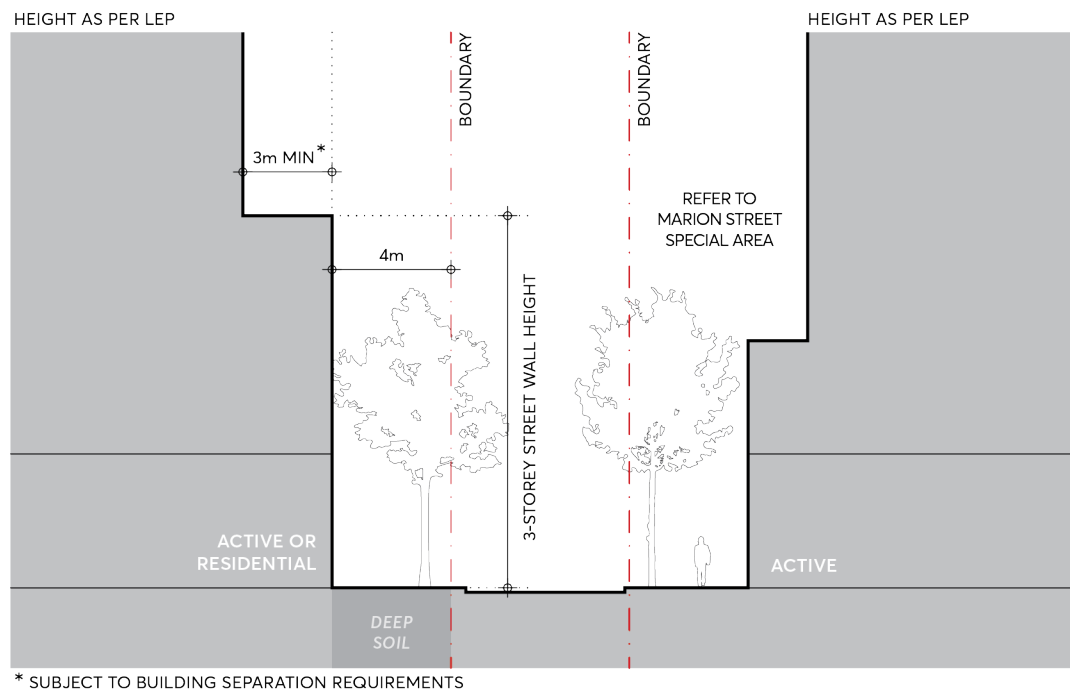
Raymond Lane (Section C) Setbacks and Street Wall Height
